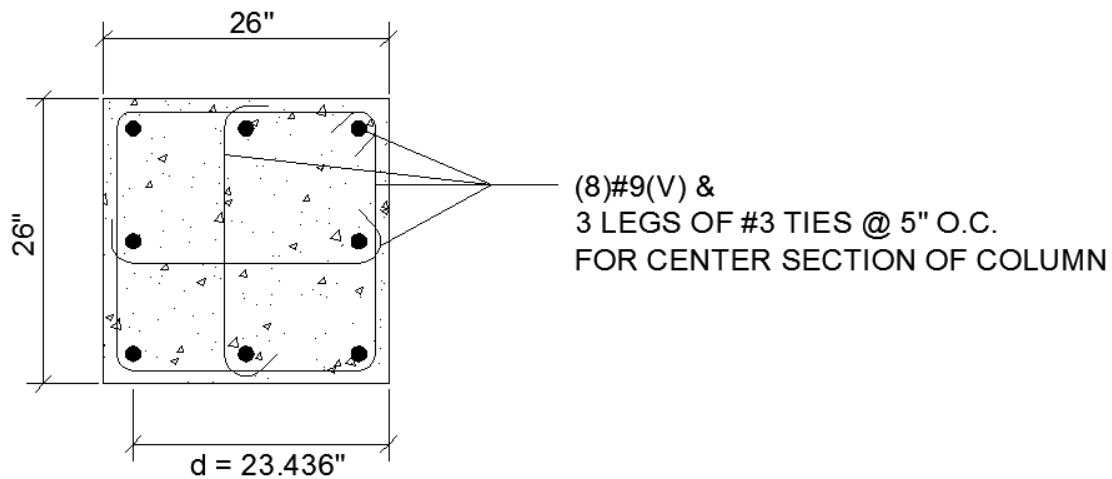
Exterior column, cross-section at center of column at the 2nd floor level based on tsunami design requirements.
